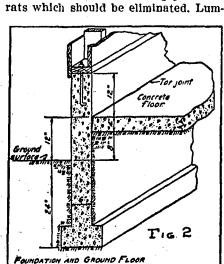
Showing a Good Method of Making Foundation and Floor of a New Buidling Ratproof.
